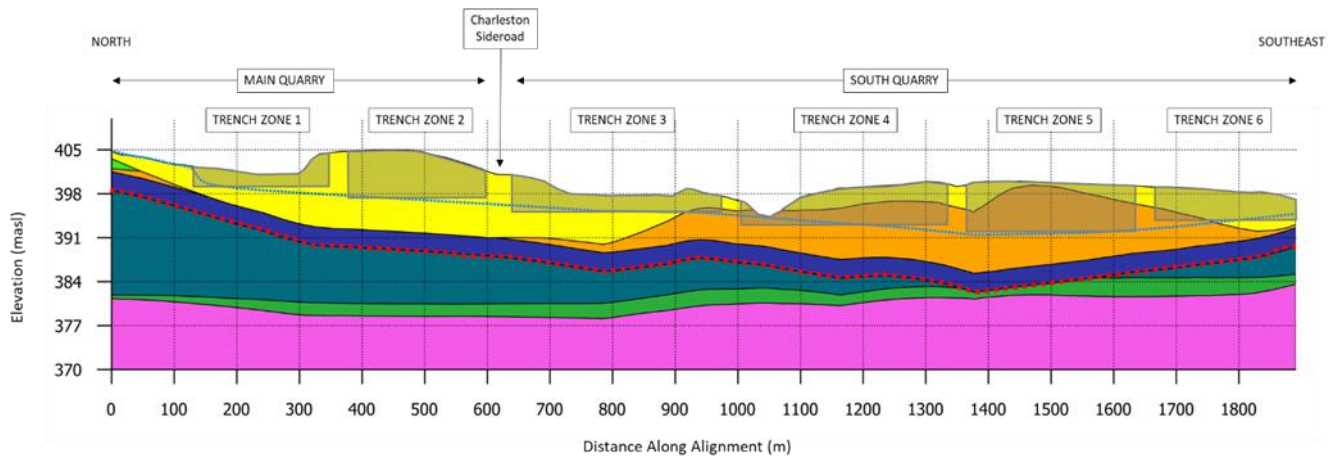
Proposed Groundwater Mitigation System, consisting of six Infiltration Trench zones and two Slurry Wall / Grout zones
